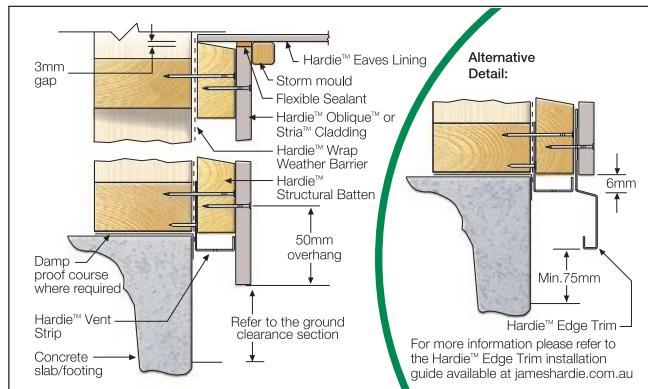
SLAB/EAVE JUNCTION DETAIL
